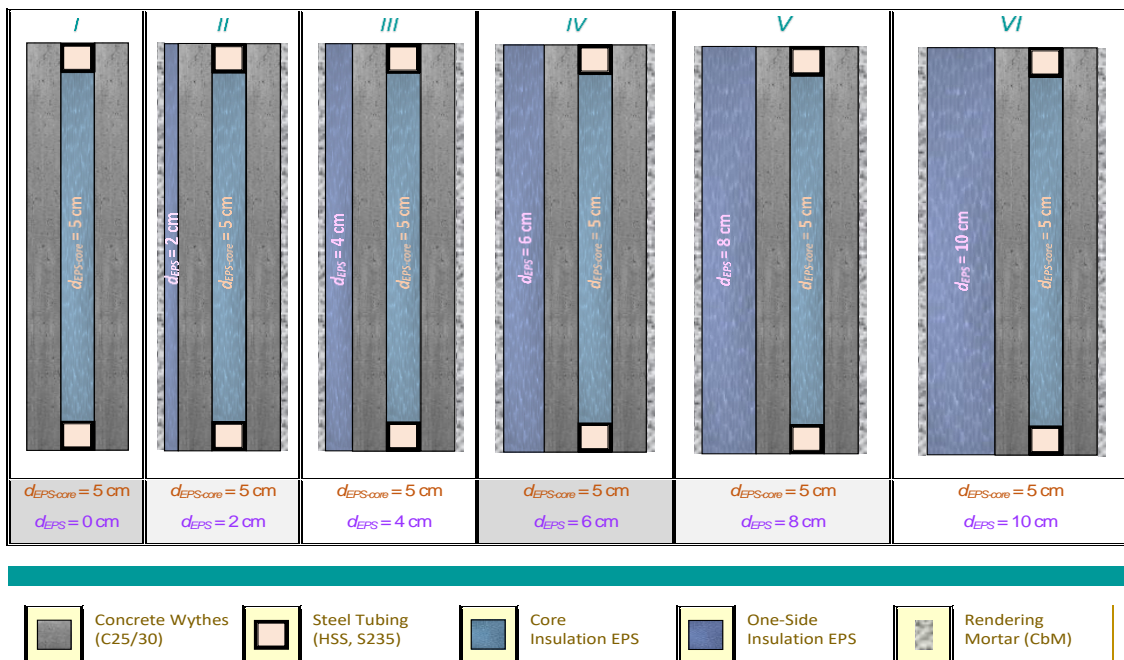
Horizontal cross-sections of precast concrete sandwich panel system (XZ view), with a varying thickness of the one-side insulation layer (d_{EPS}).
